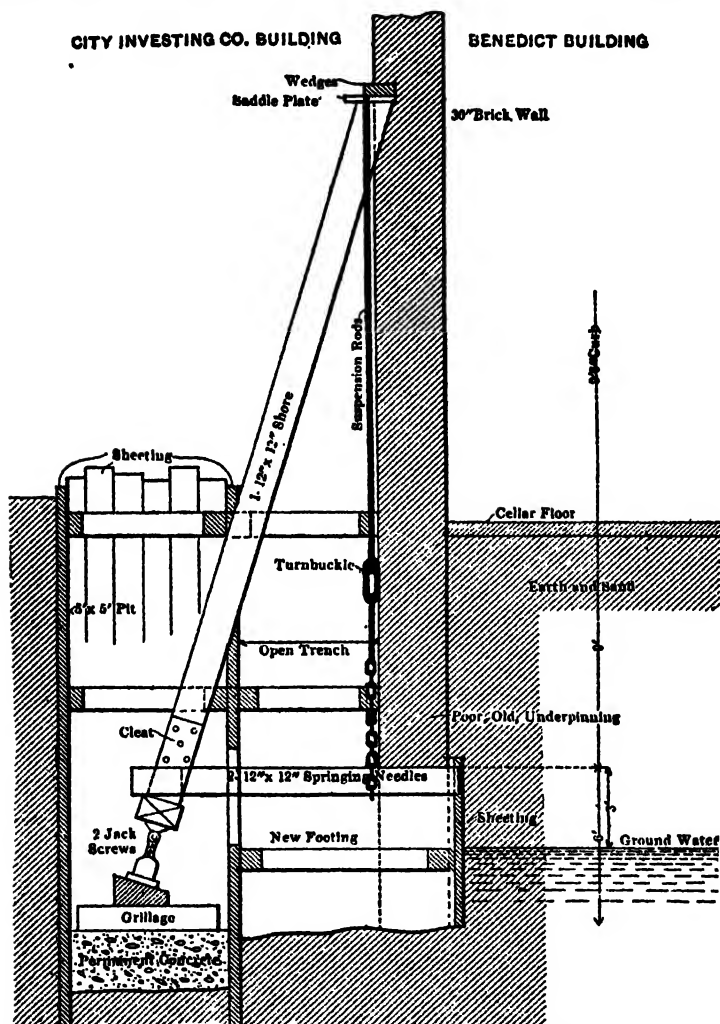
Underpinning with Figure-4 Needle Method, Benedict Building, New York City.
